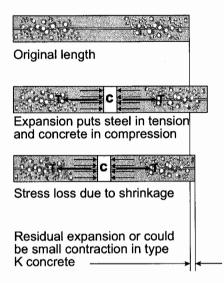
Expansive Concrete: Cracking caused by drying shrinkage of concrete is prevalent in reinforced concrete structures. Shrinkage-compensating cements, when properly restrained by reinforcement, can generate chemical precompression in the concrete which can compensate the tensile stresses created by the drying shrinkage. Most expansive cements employ the controlled expansion of ettringite at early ages by modifying the composition of traditional portland cement.
